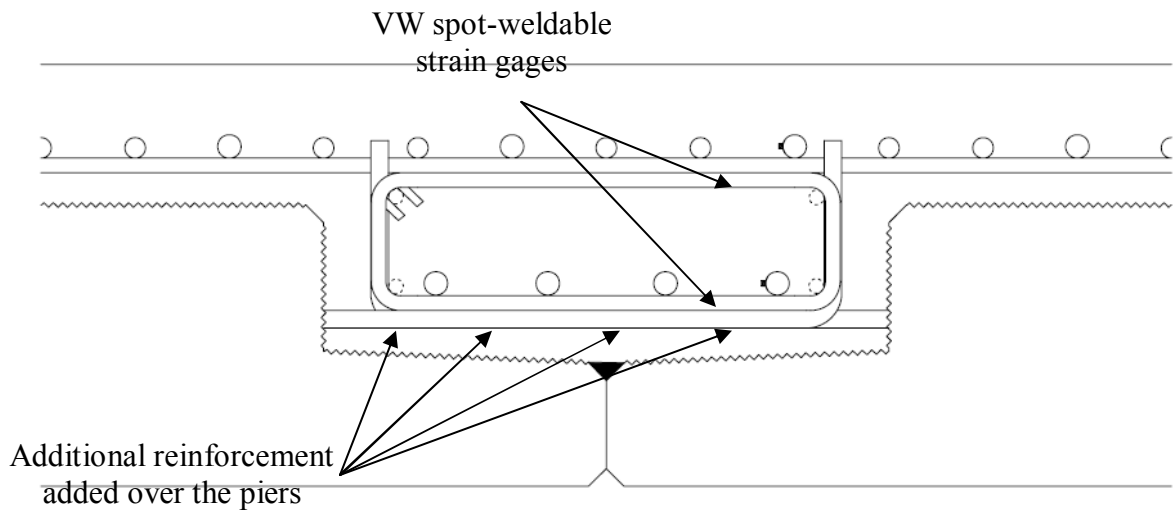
Cross-sectional view of instrumentation detail for locations with 2 VW spot-weldable strain gages (“●” in Figure 4.13)
